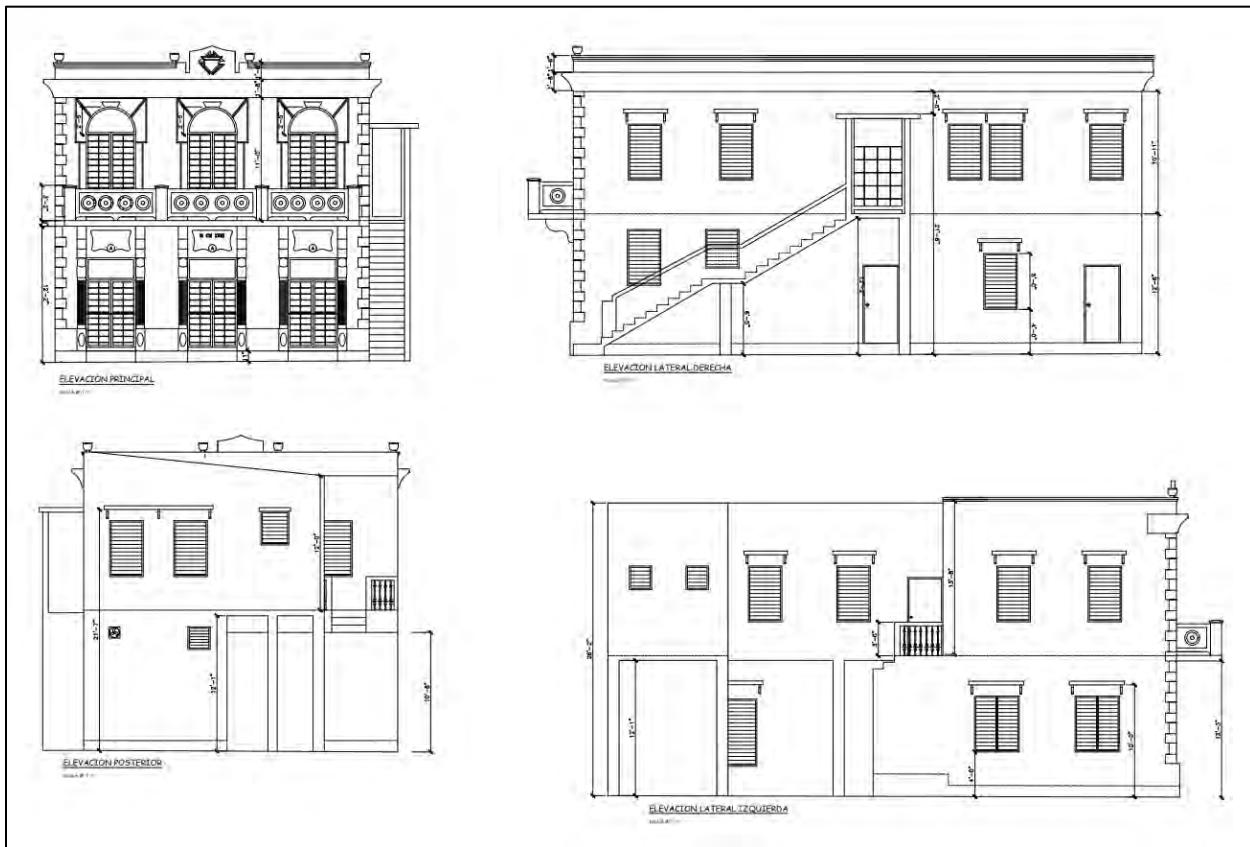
Frontal façade (left) and posterior façade (right) (Ingenieros del Oeste C.S.P 2022)
